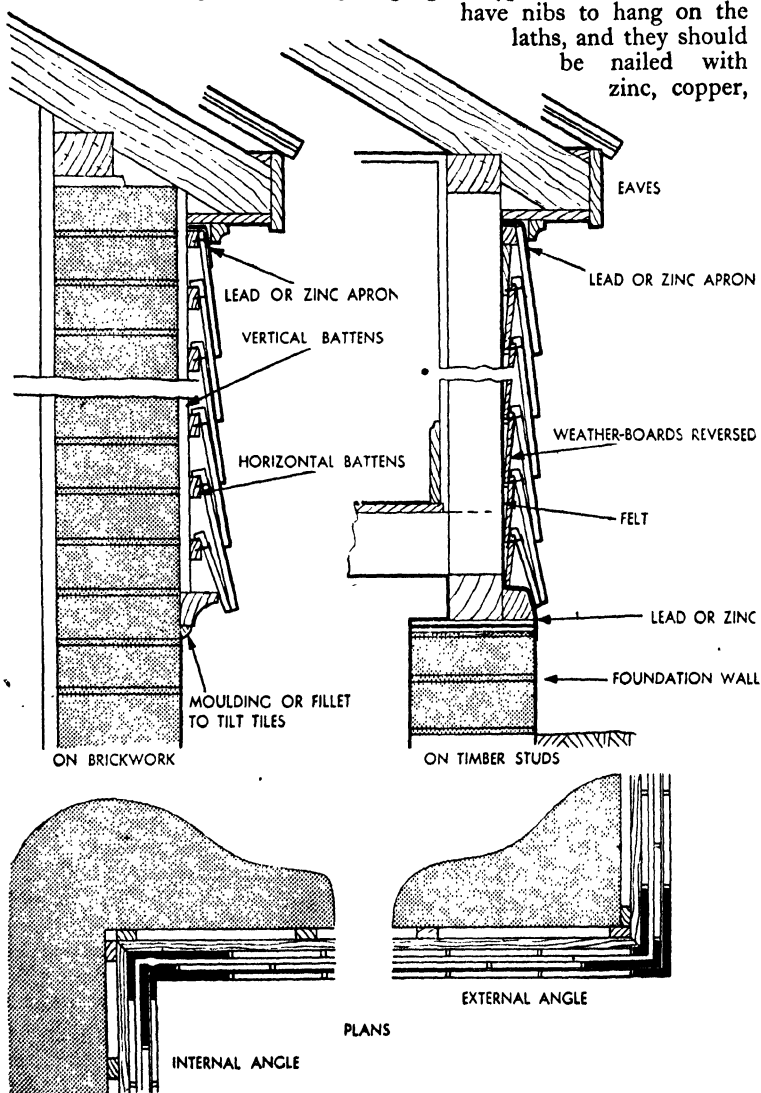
Method of tile hanging to cure dampness in existing walls. Wall tiling is usually carried down to the level of the ground-floor window heads, but if it is designed to cover the whole wall, the tiles should finish approximately 15 in. above the ground level. The lowest course is tilted by fixing a fillet to the wall.
